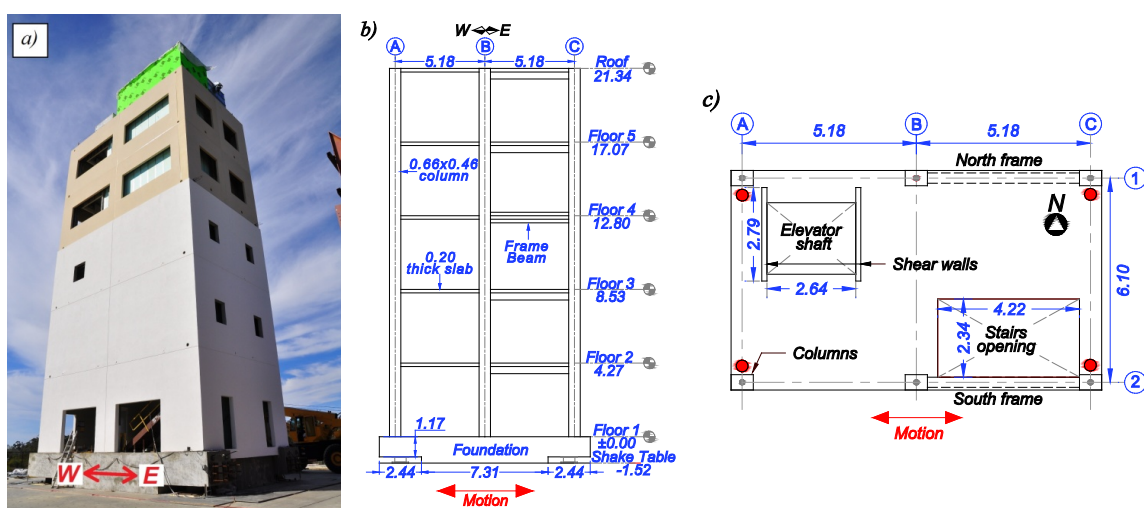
Test specimen: (a) completed building, (b) schematic elevation view, (c) schematic plan view. (Dimensions in m)
